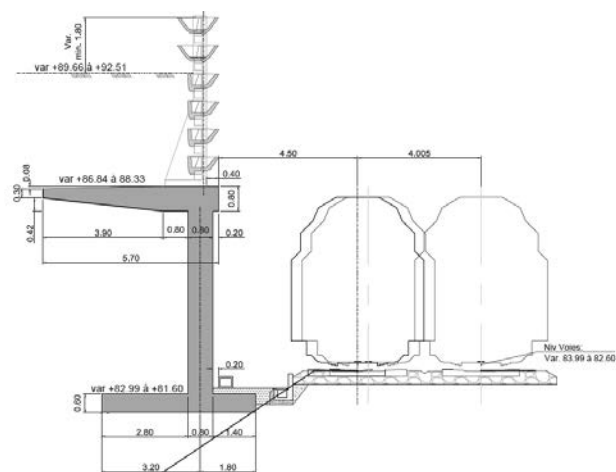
View of the inverted T-shaped cantilever wall with a relief floor of 3.9 m.
